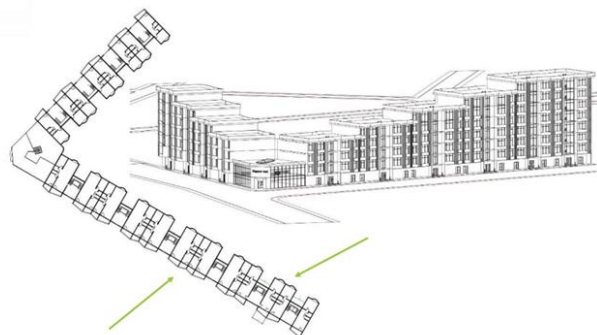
Typical floor plan of a building with two-sided apartments to the north-west and south-east
